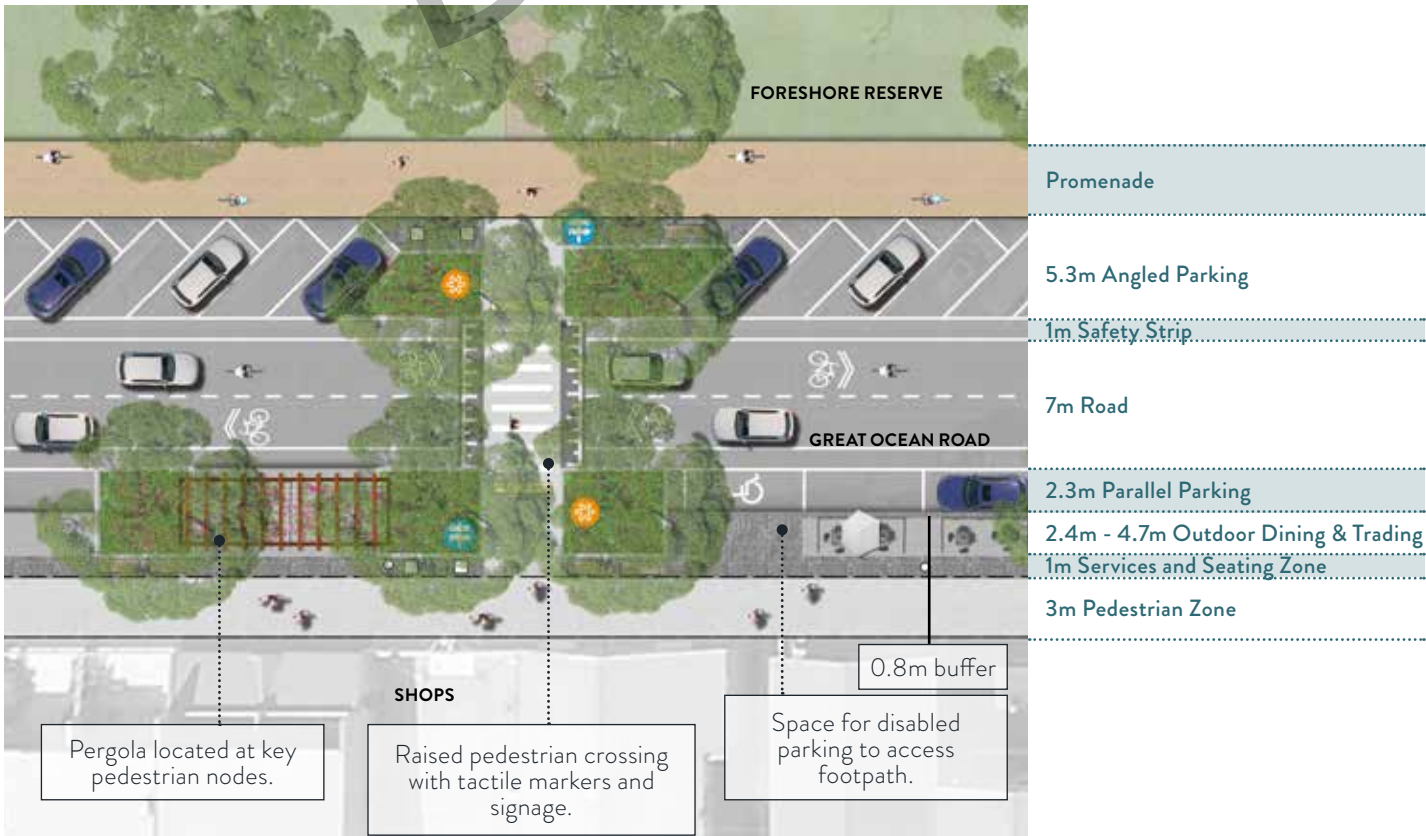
Proposed Plan - Outdoor Dining and Trading Zones - Two-Way
